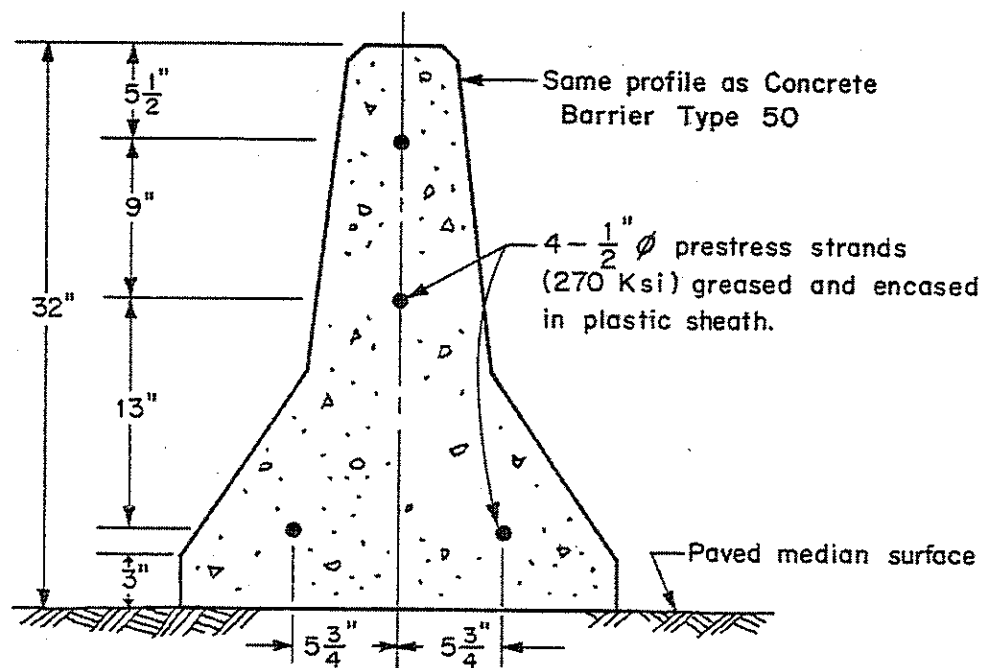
, TYPICAL SECTION OF PRESTRESSED CONCRETE BARRIER TYPE 50
